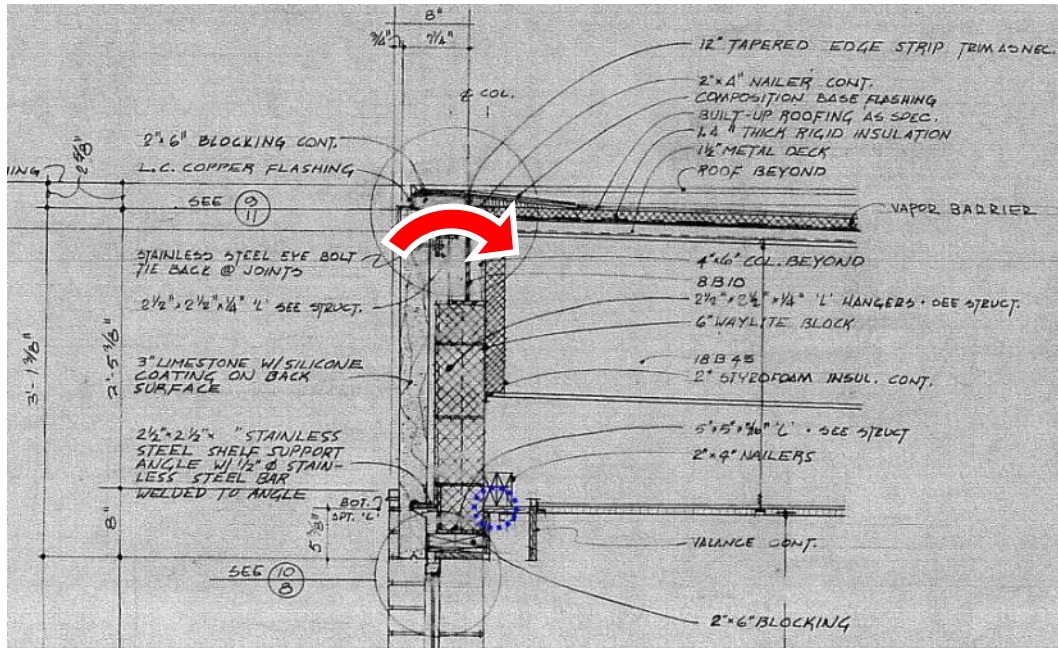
Typical window/wall section detail. Detail taken from 2/12 of the 1968 Drawings. Point of air infiltration during smoke testing indicated by blue dashed circle.
